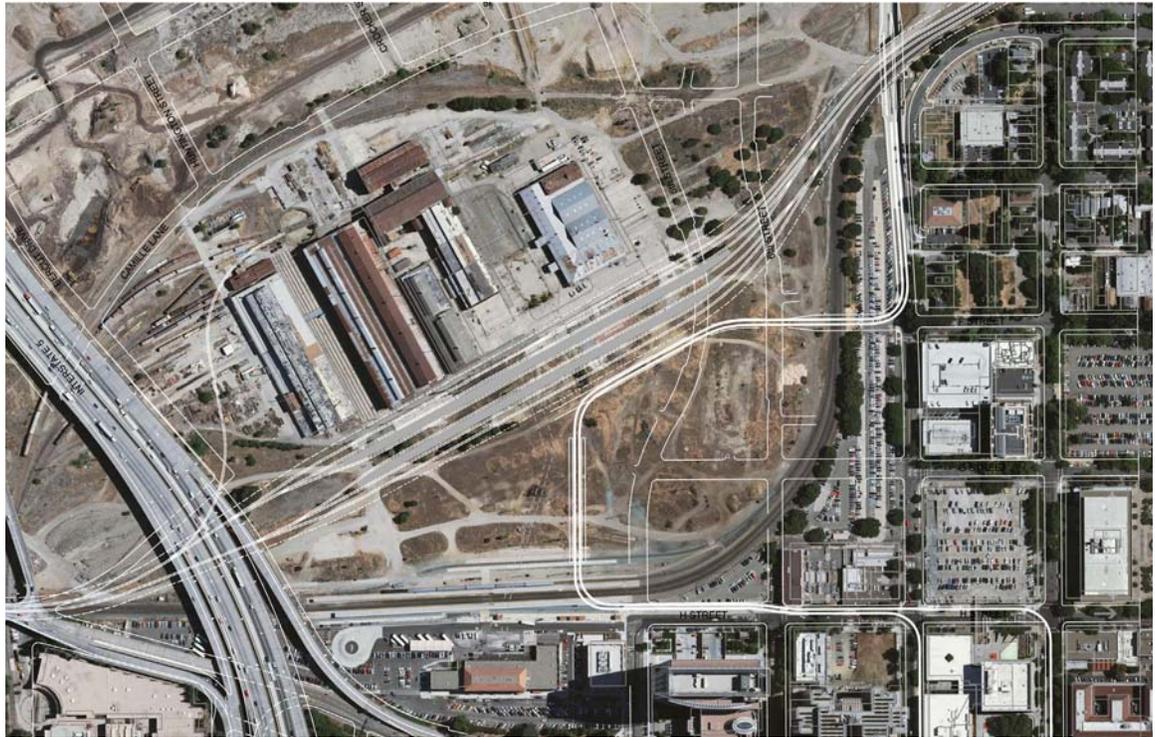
Existing Aerial of site with overlay of new rail alignment
